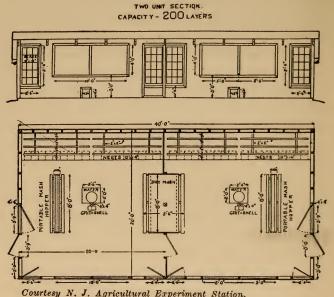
Front and floor plans of a double unit 20'x40' laying house to accommodate 200 layers.
